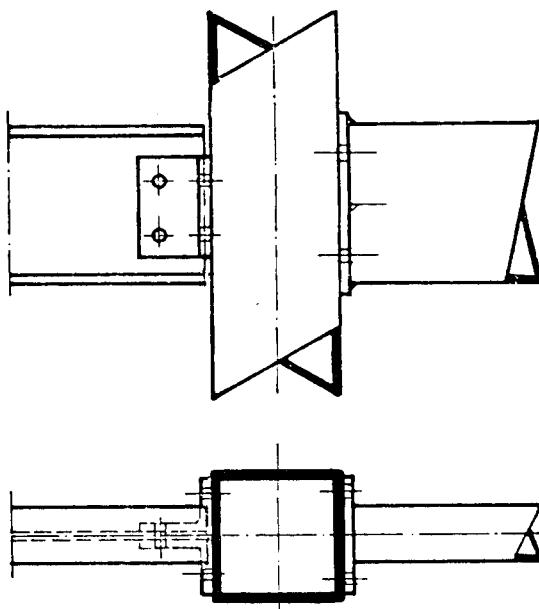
Blind bolted beam to column connections of hollow sections
